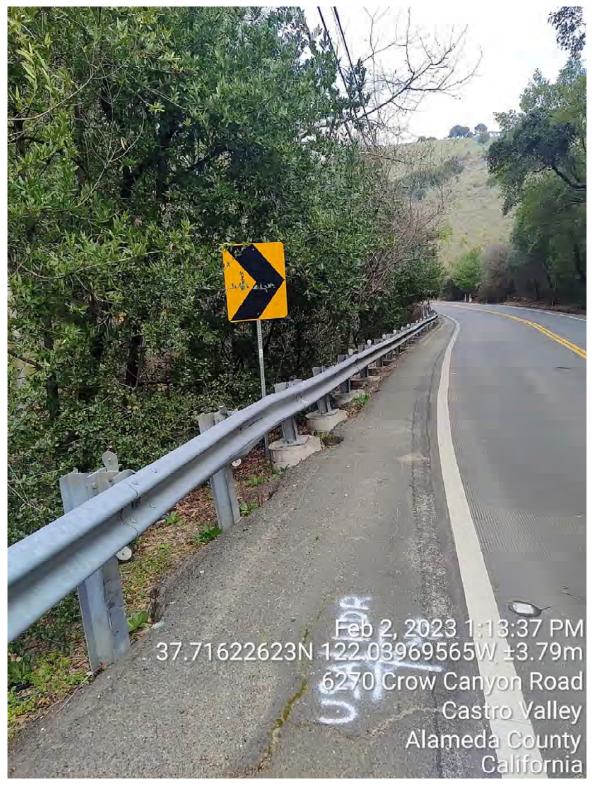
Slope with Flat Bench Below Boring A-23-004 Looking North
